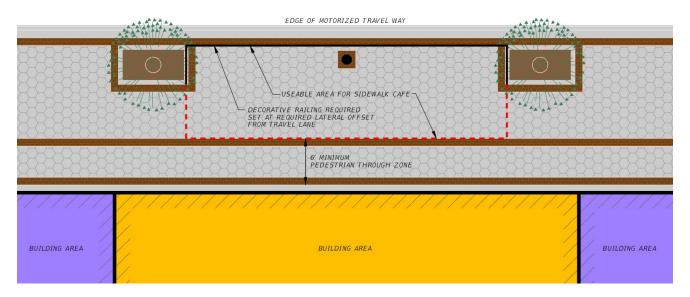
Typical Sidewalk Café Boundary Utilizing Furnishings Zone
